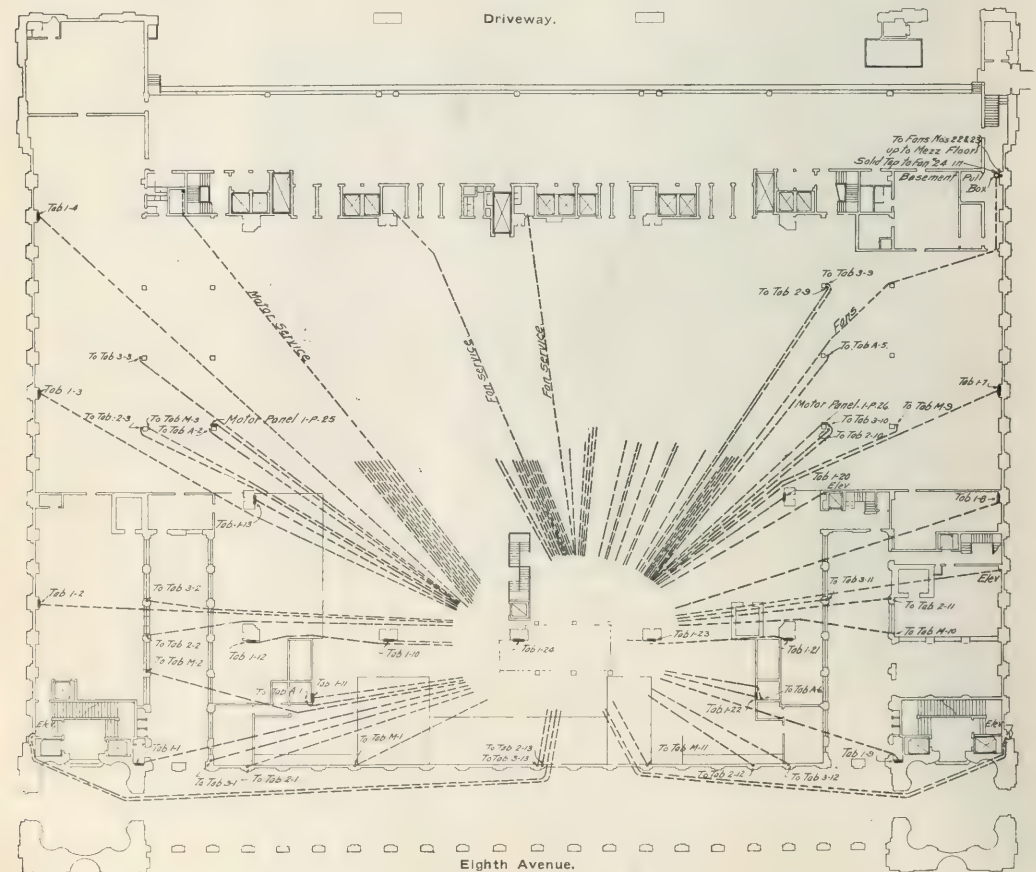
FEEDER LAYOUT ON FIRST FLOOR, LEADING FROM SWITCHBOARD IN BASEMENT, FOR LIGHT AND MOTOR SERVICE TO THE SEVERAL FLOORS
